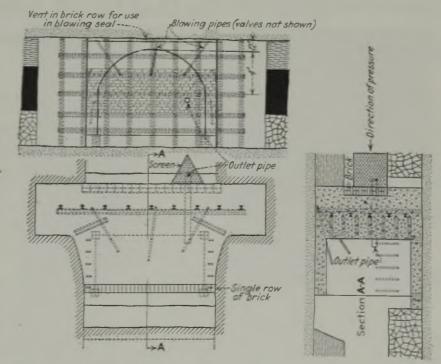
Completed High-Pressure Seal, Showing Position of Blowing Pipes, Outlet Pipe and Use of Brick Across Heading on Pressure Side
